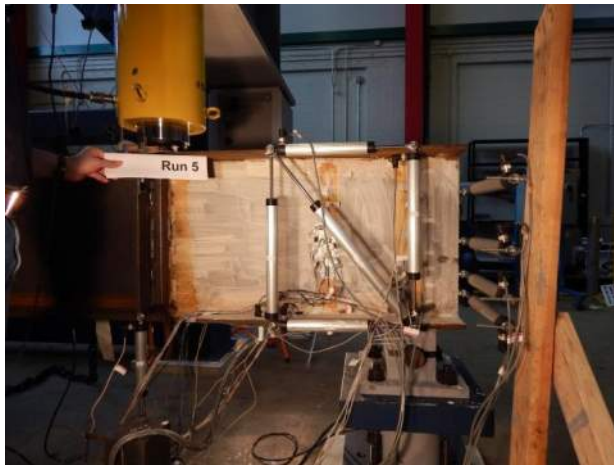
Undamaged Girder Left: 120 kip
